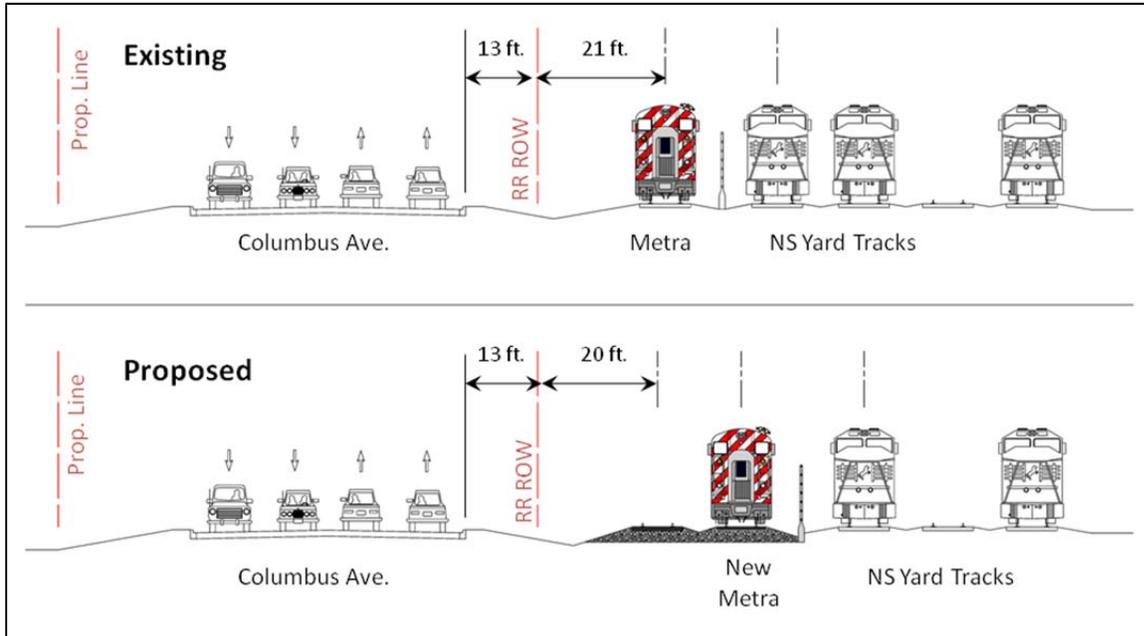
Alternate CA-2 and Existing Conditions, Looking Northeast along Landers Yard
